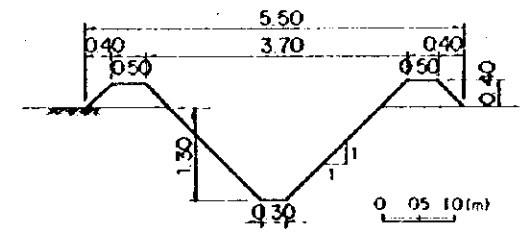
LAYOUT OF PROPOSED ON-FARM DEVELOPMENT WORKS
